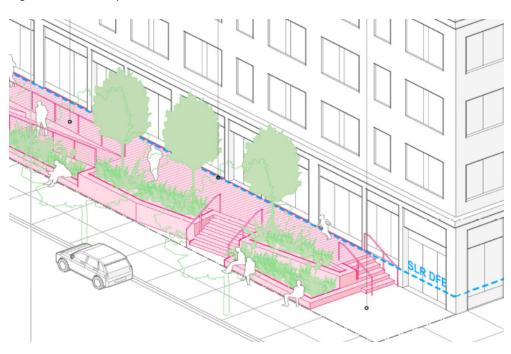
Flood Zoning Design Guidelines - Dry Floodproofing Source: Boston Flood Zoning Design Guidelines,
